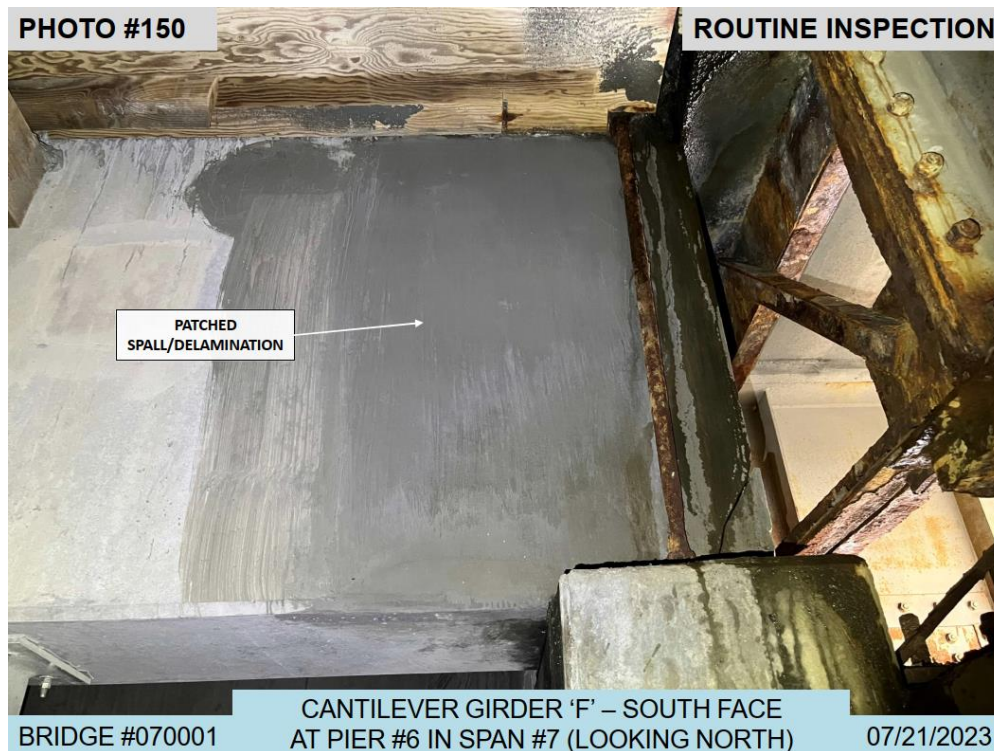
Inspection photo of exterior tie-down rod for cantilever beam F at Pier 6 taken July 2023 (AECOM).
